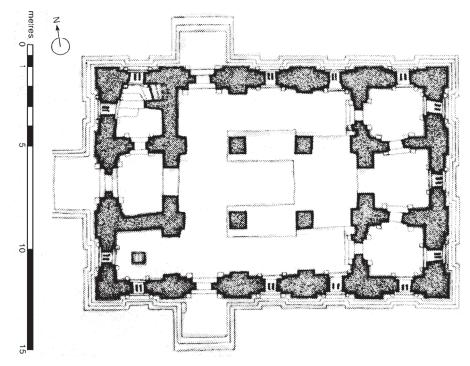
Church of Lalibäla Amanu[°]el, Wällo, floor plan; after L. Bianchi Barriviera
